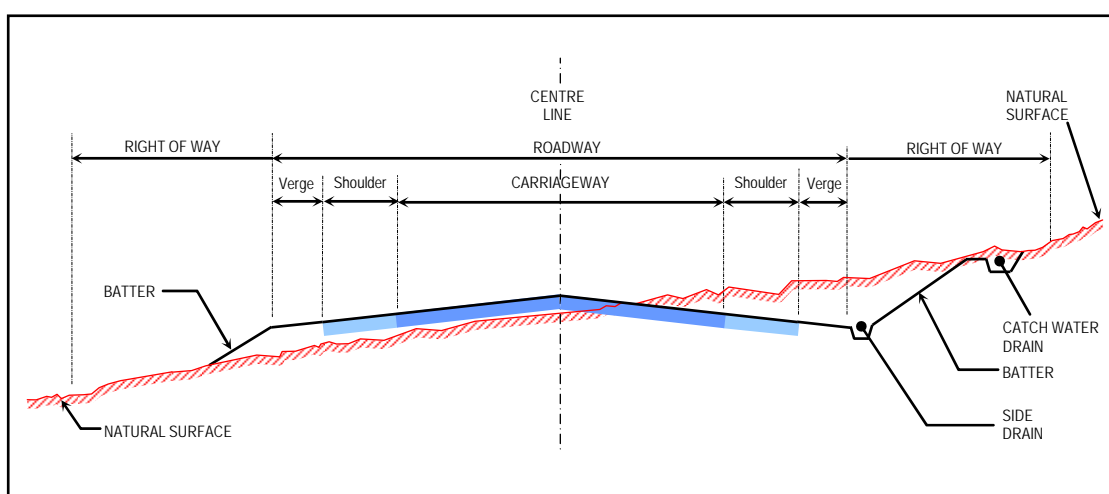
ELEMENTS OF ROAD CROSS SECTION (Not To Scale)
